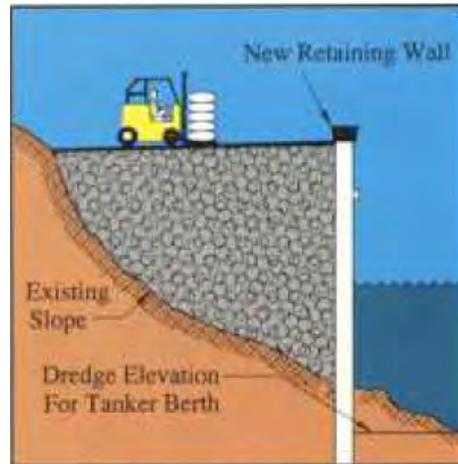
Expanded shale used as retaining wall backfill (ECSI, 2013)
